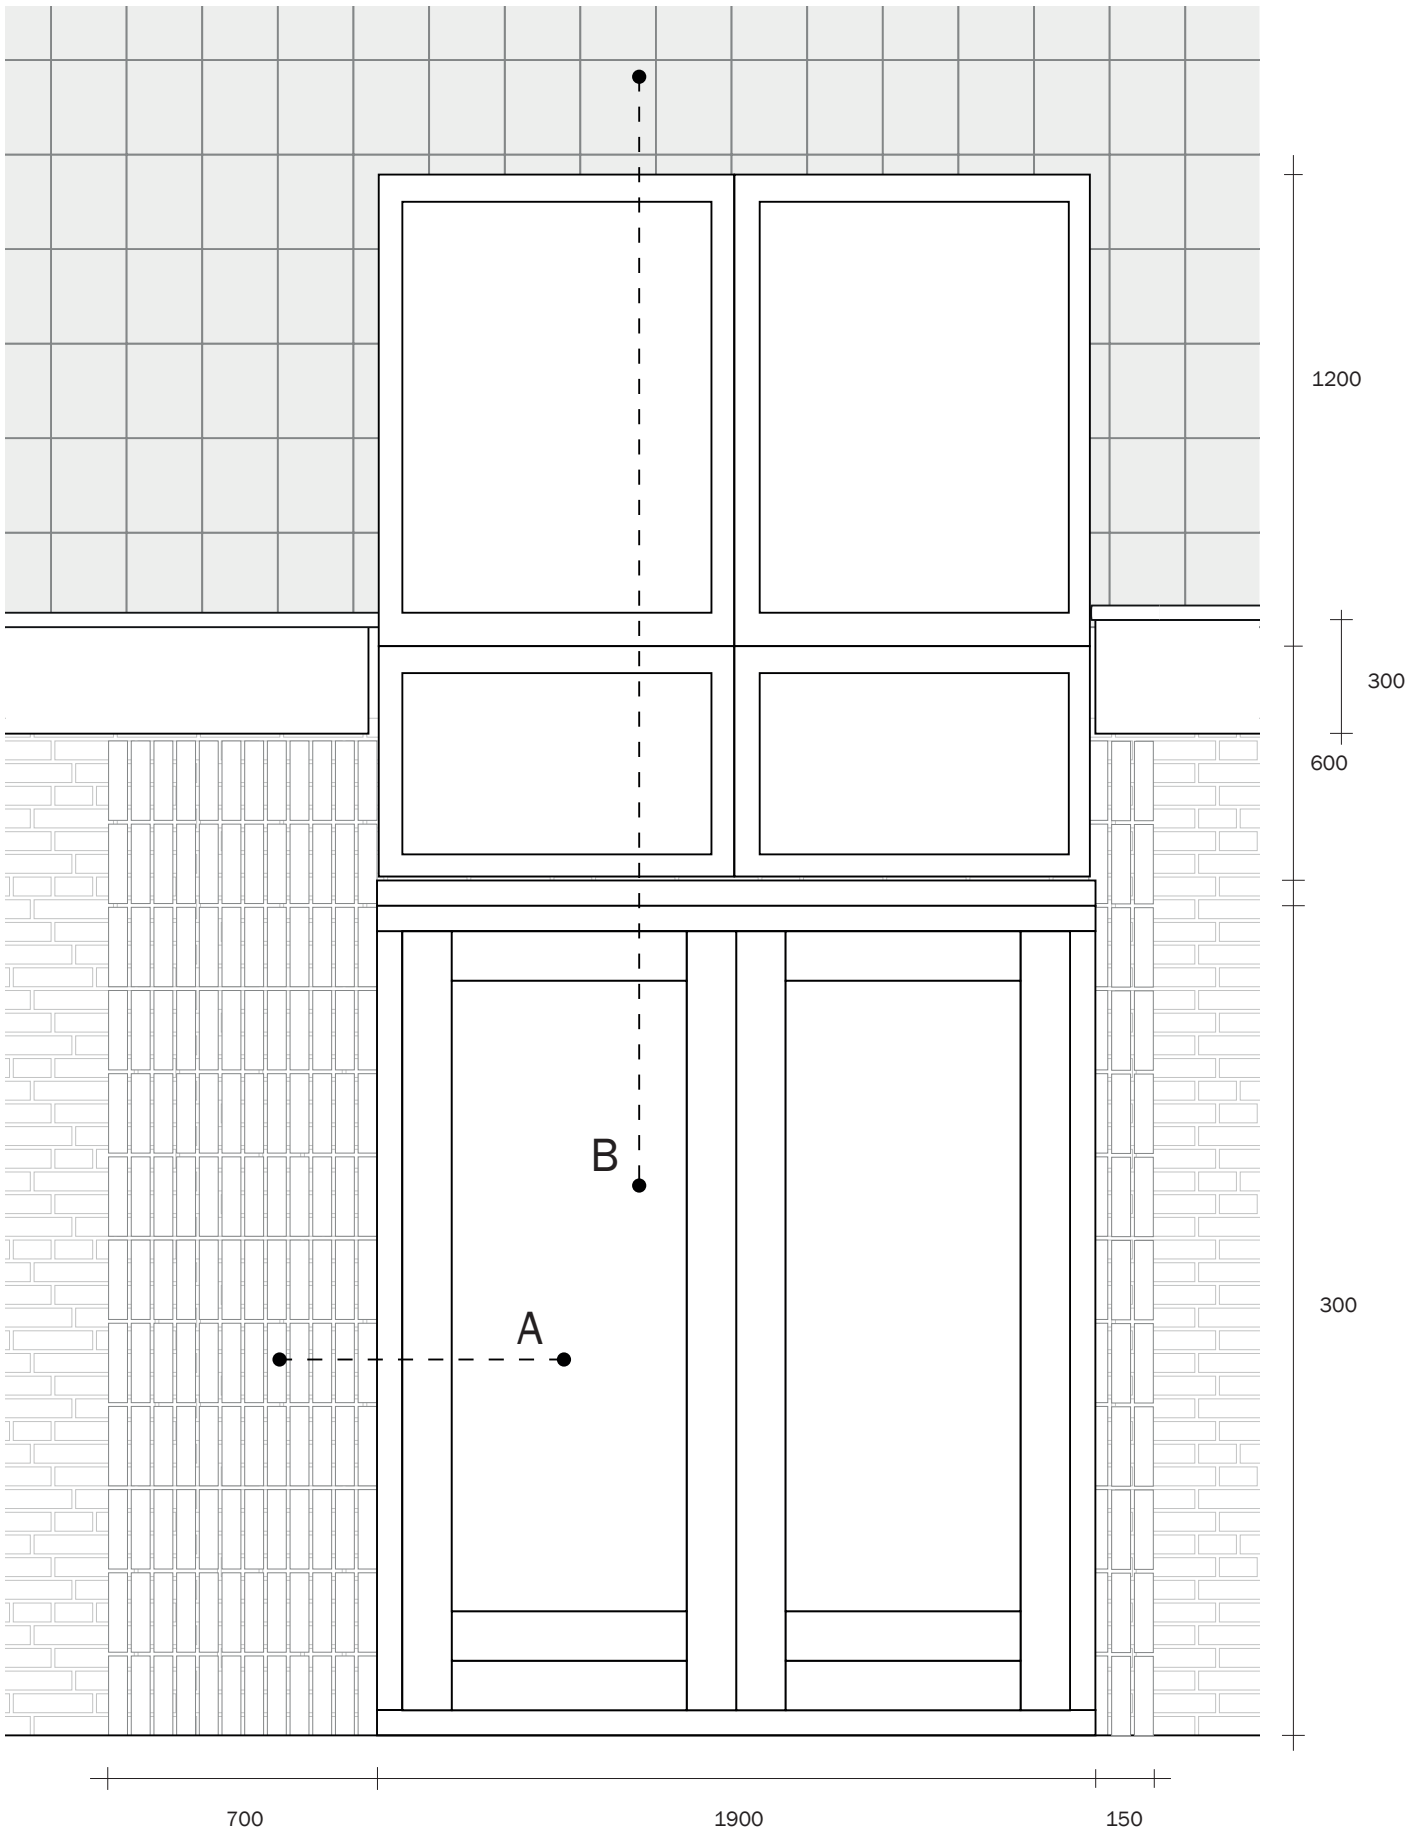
Facade design 1:50, left: private that does not participate in full renovation, right: Ymere home with home split and full renovation
